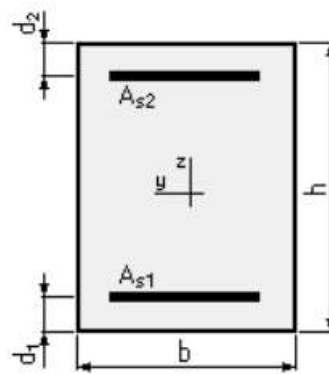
Beam cross-section layout and reinforcement nomenclature (SECONDARY BEAM DESIGN: PS 30x30).
